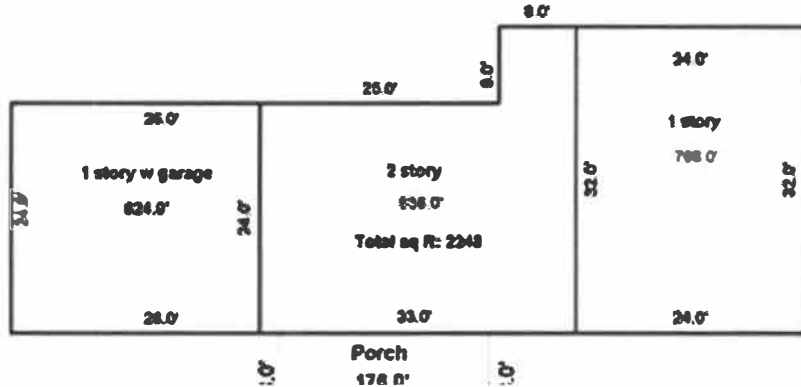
Floor plan from PVA. Please note that the total floor area indicated on the drawing is calculated including the garage but not the second story
